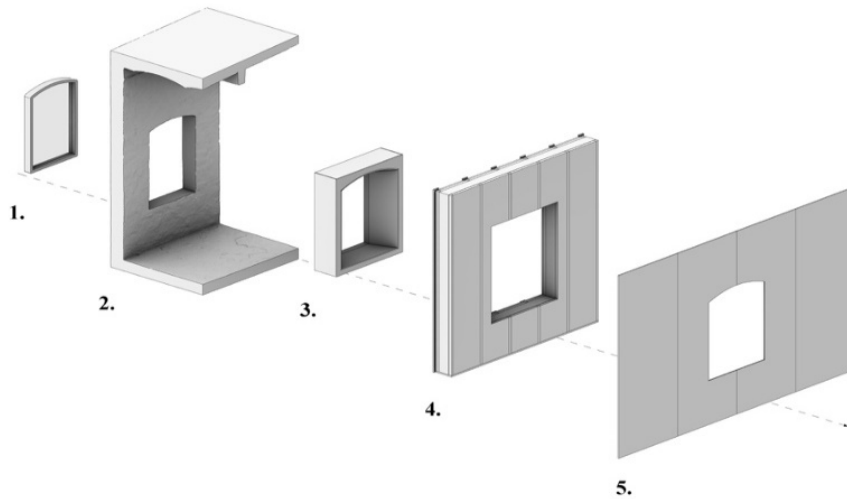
1. New window, 2. 3D scan of existing wall, 3. Bespoke Digichalk module, 4. New woodfibre backwall, 5. New internal cladding.
